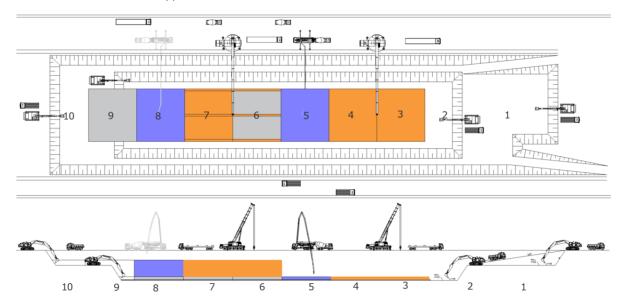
Schematic Showing Proposed Cut and Cover Construction Activities
